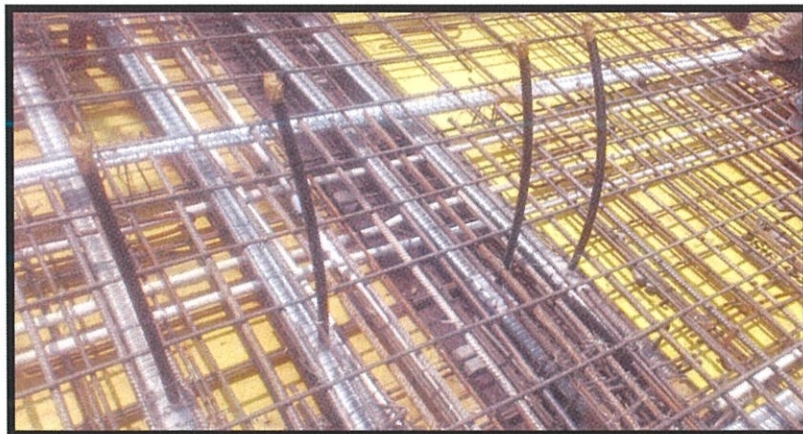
PVC hoses installed at end zones as grout ventilation
